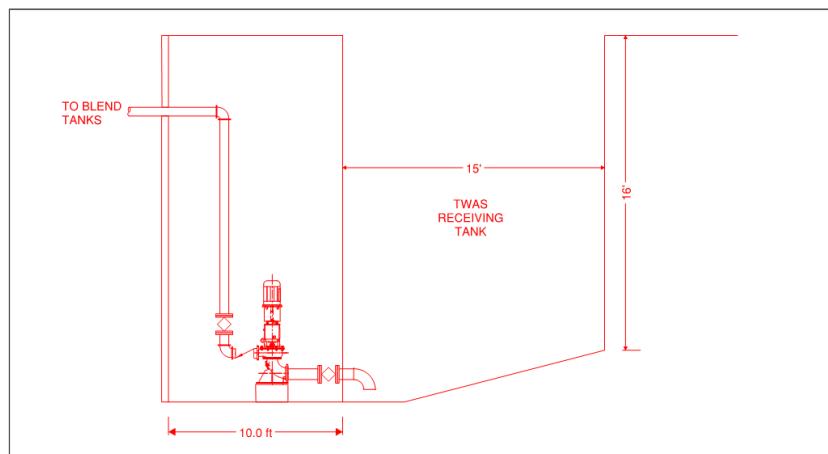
Proposed TWAS Pump Station and Receiving Sump (ALT 2)
